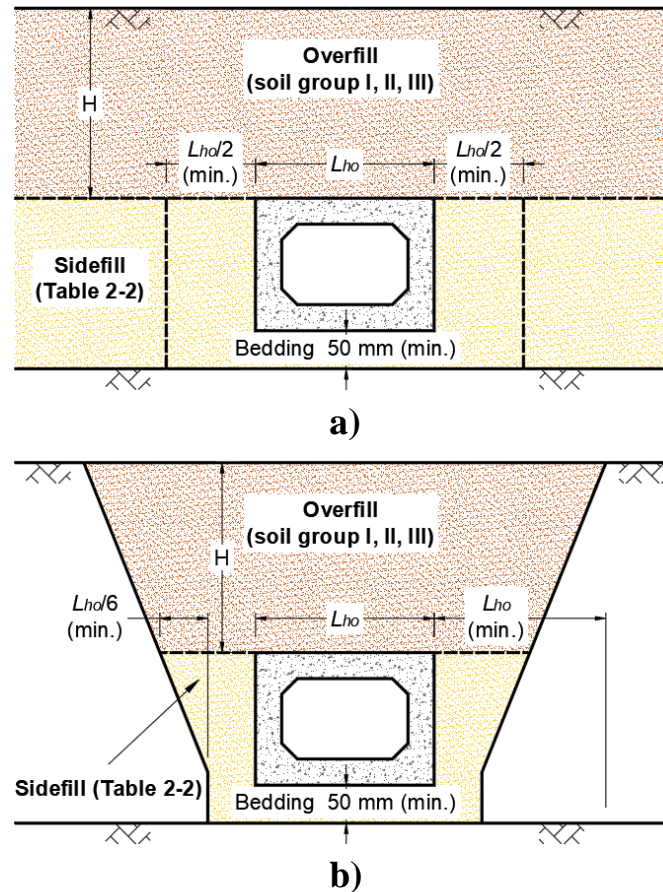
Standard installations for RC box culverts in the CHBDC (CSA, 2014): a) on embankments; and b) in trenches.
